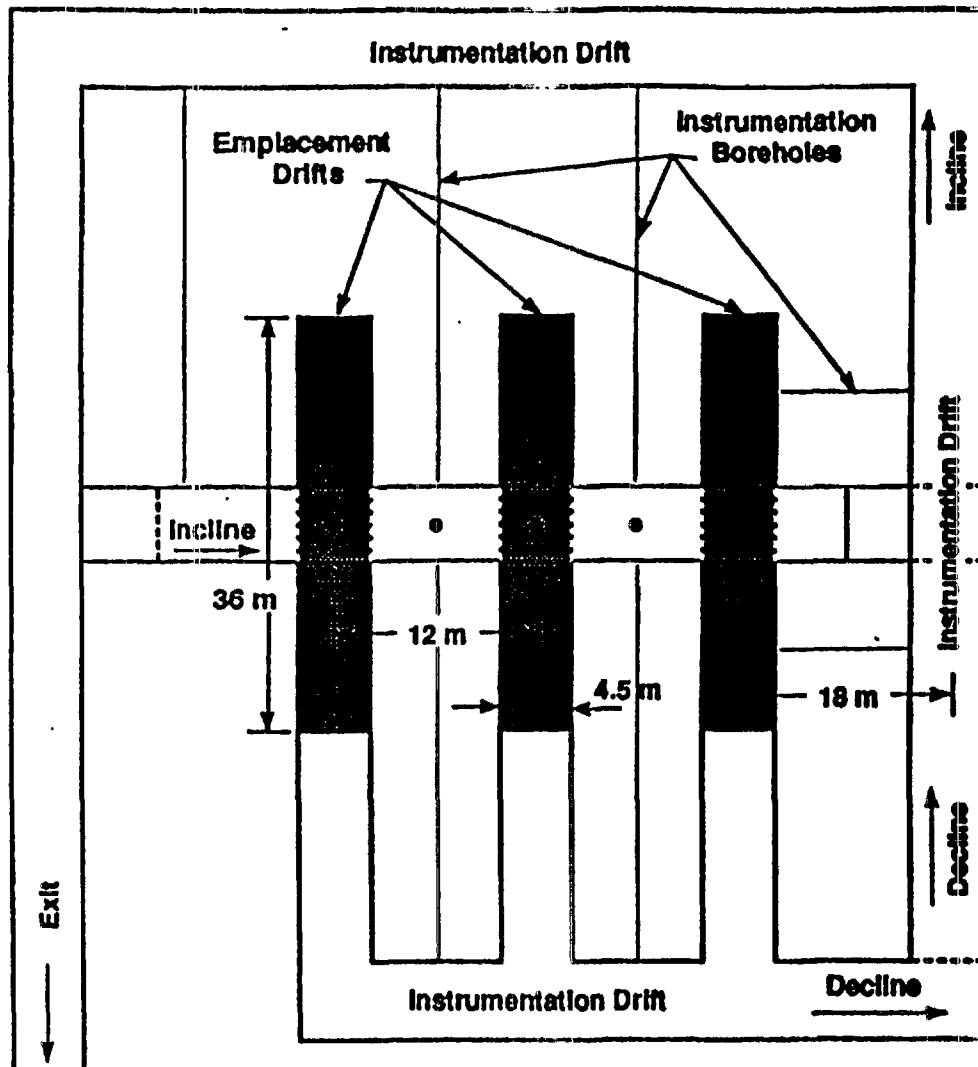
Plan view of general layout of emplacement drifts, instrument drifts, and instrumentation boreholes for LSLD test (from DOE, 1995c).
